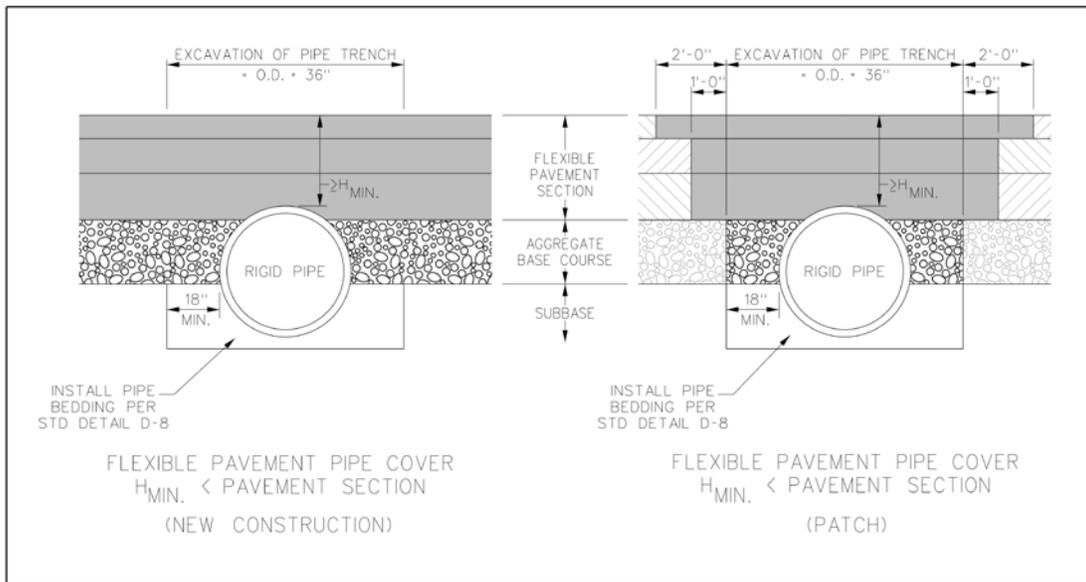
b Existing Pavement Shallow Pipe Cover Details
